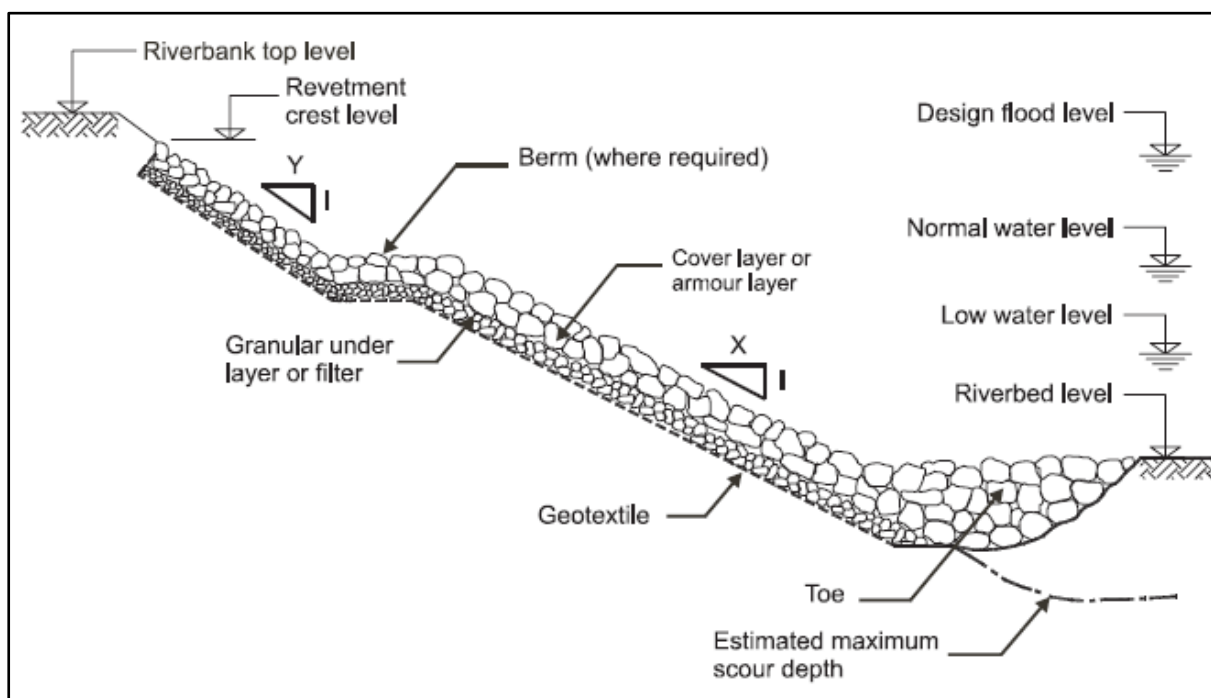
Example cross Section of a rock revetment structure (Source: (CIRIA 2007))
